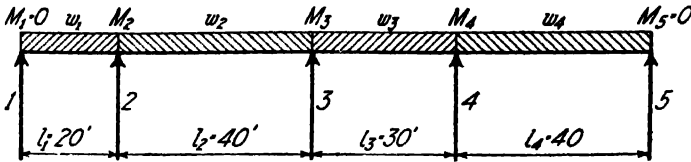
Sketch of a Four-Span Continuous Girder.
